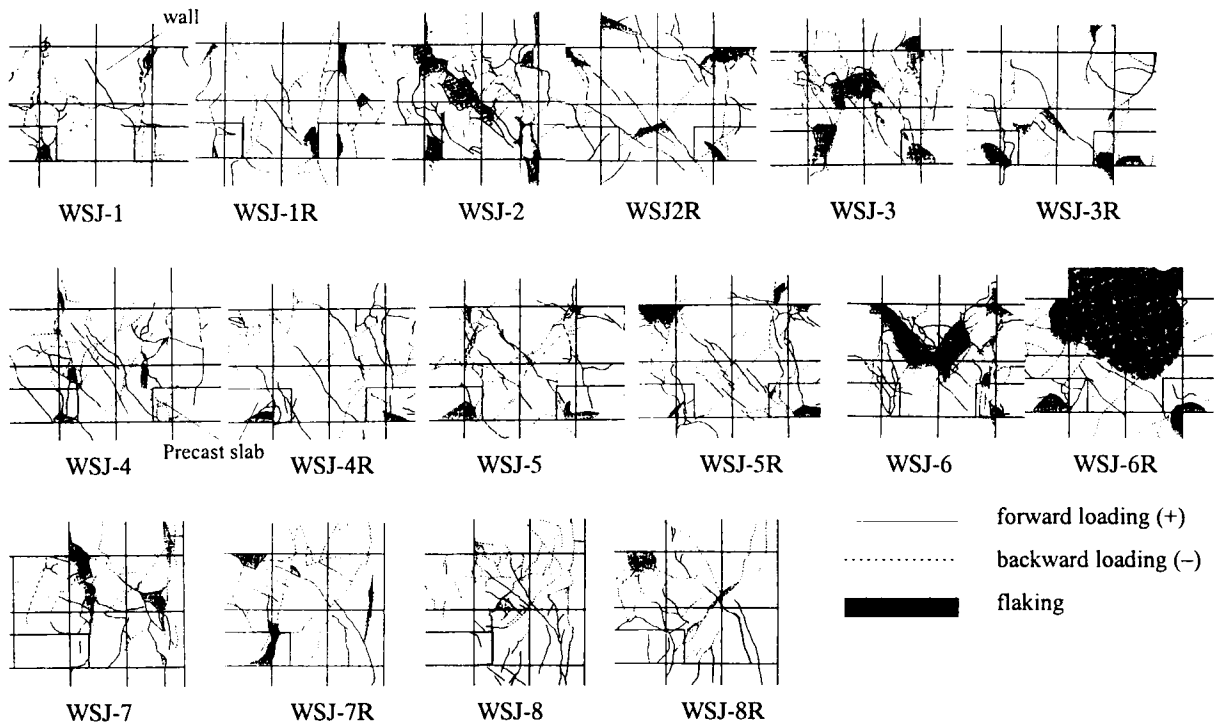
Final cracking arrangement in joint core of wall-floor connections (indexes of repaired ones with letter R)
